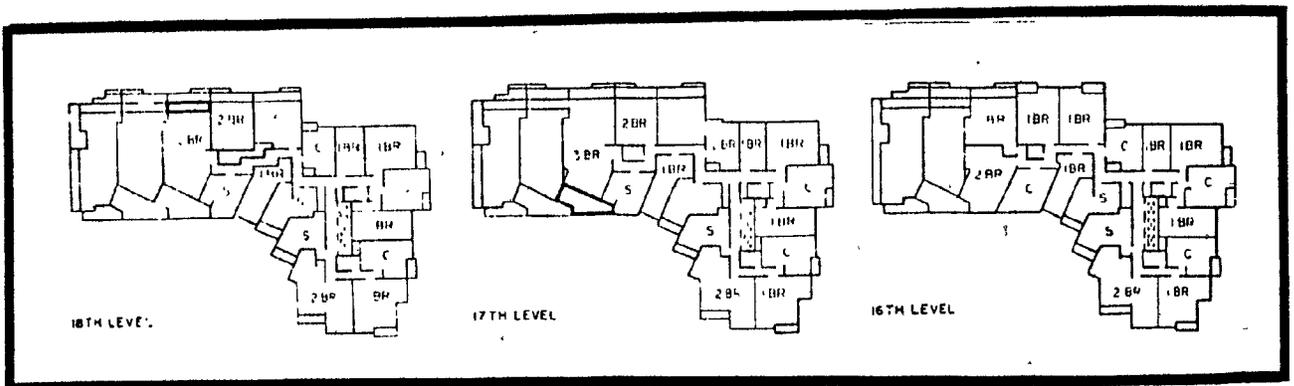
Typical apartment floors, where the architect has paid a lot of attention to the roofs and terraces and concealed the "ugly stacks". "These are buildings which you can look down on from your apartment".
